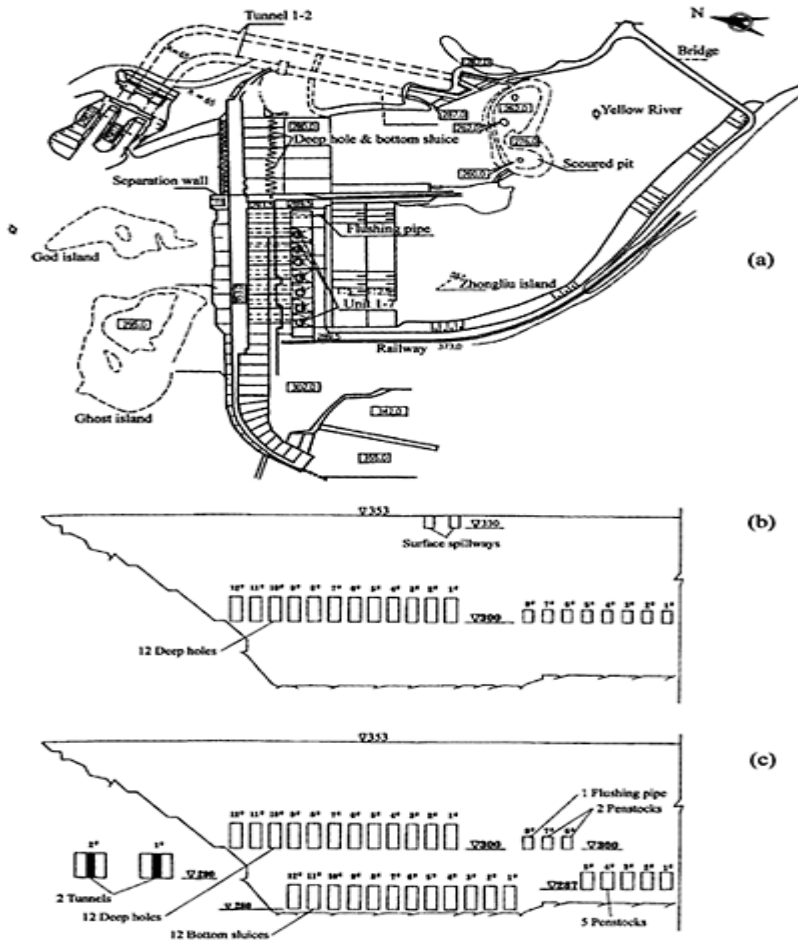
General layout and outlet structures of Sanmenxia Dam: (a) Plan view; (b) Front view of original design; (c) Front view after reconstruction.
